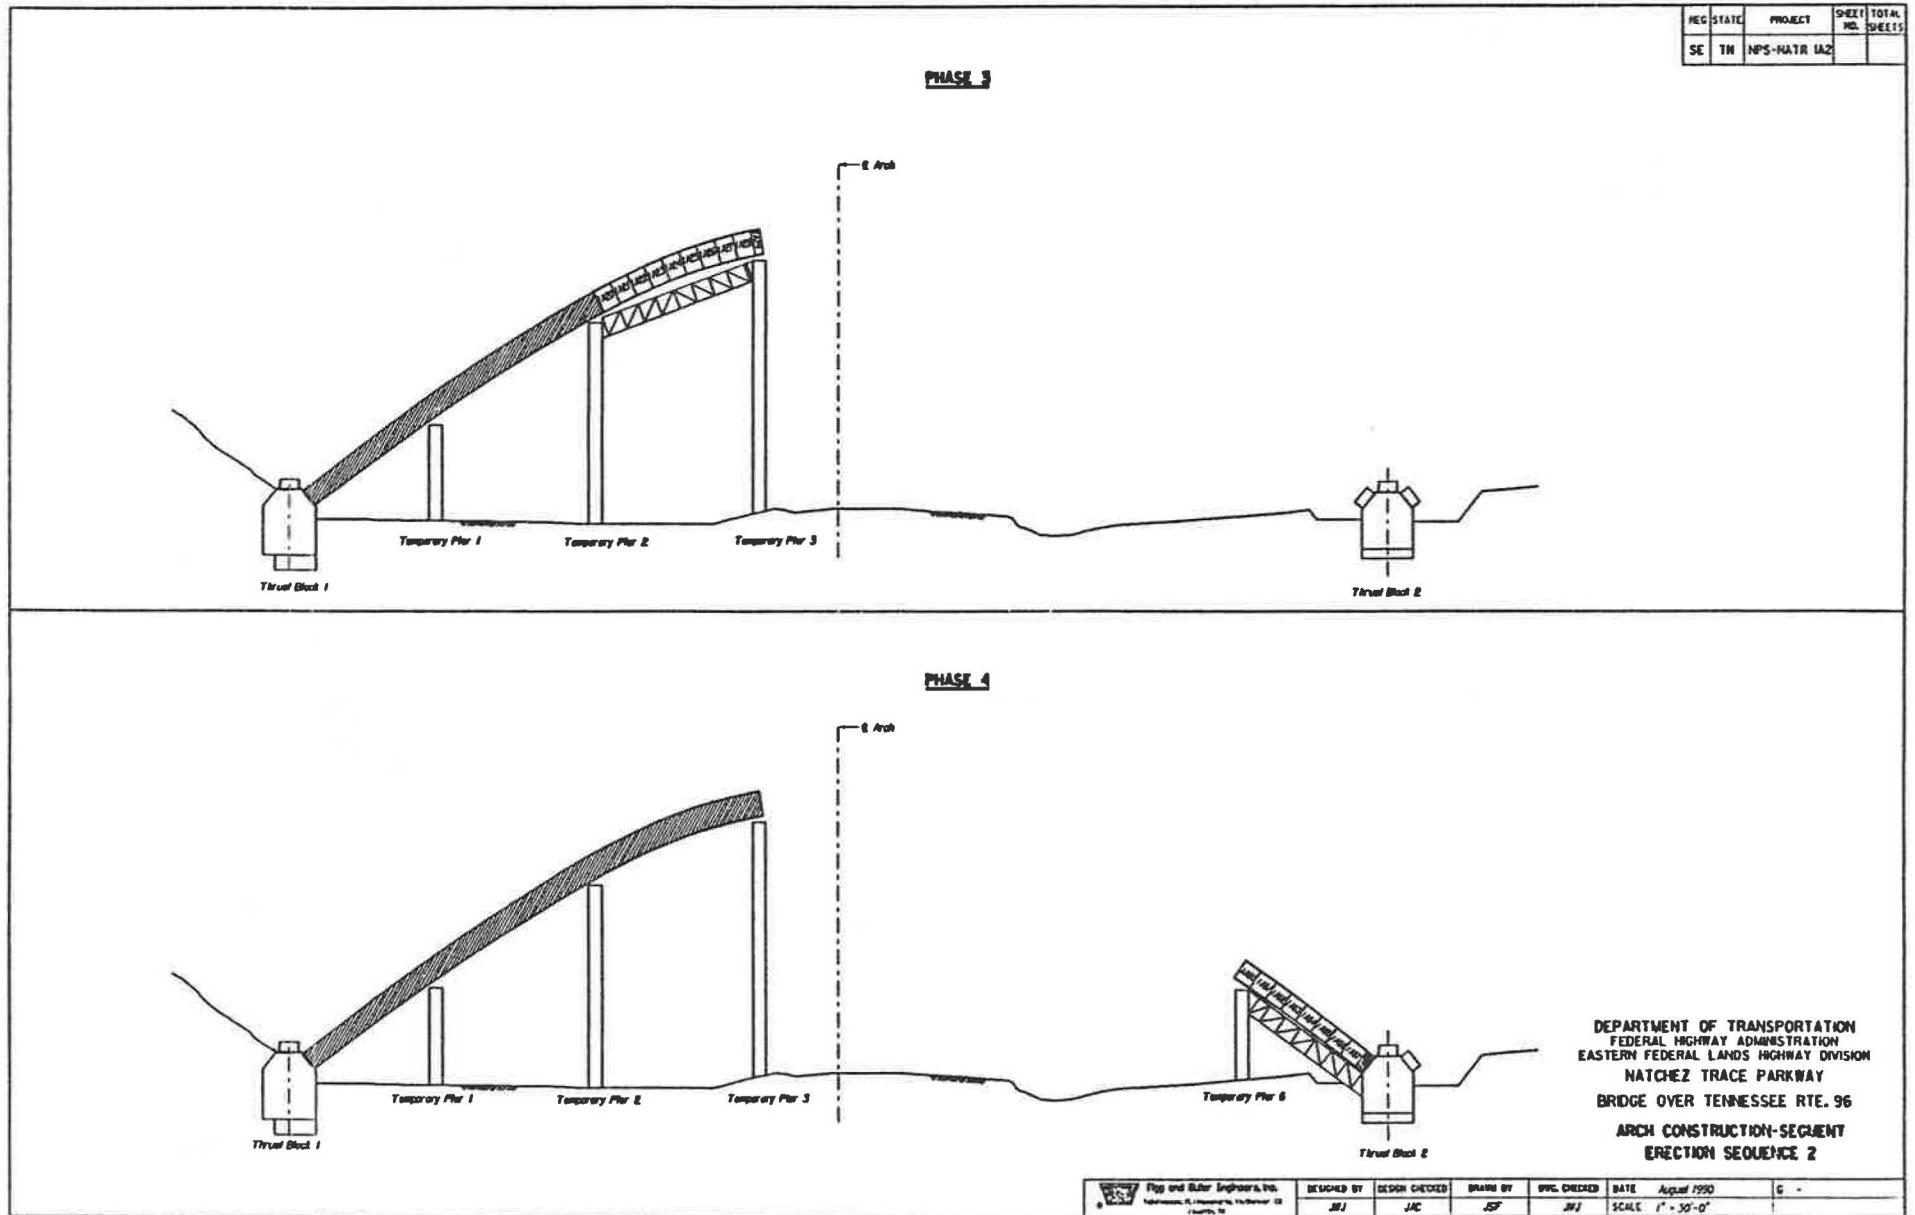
Arch construction - precast alternate - phases 3 and 4
